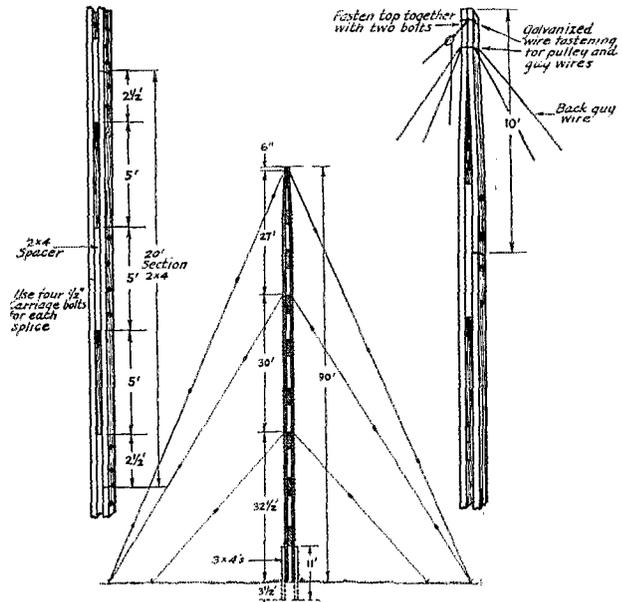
THE COMPLETED MAST AND DETAILS OF CONSTRUCTION
